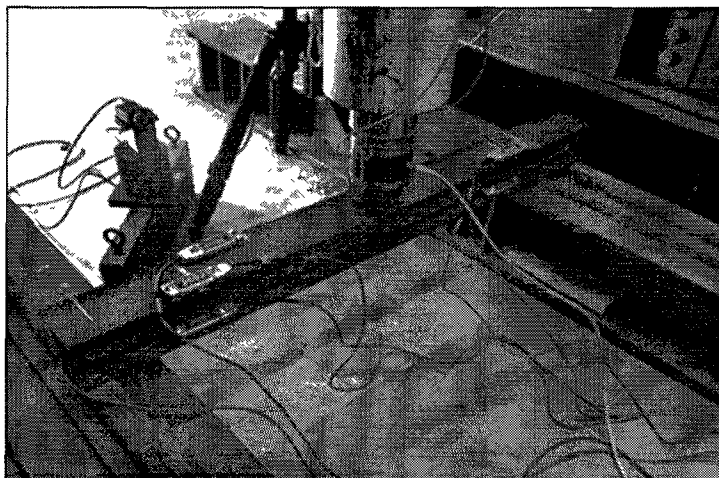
A laboratory test measuring displacement of a wide flange beam.
